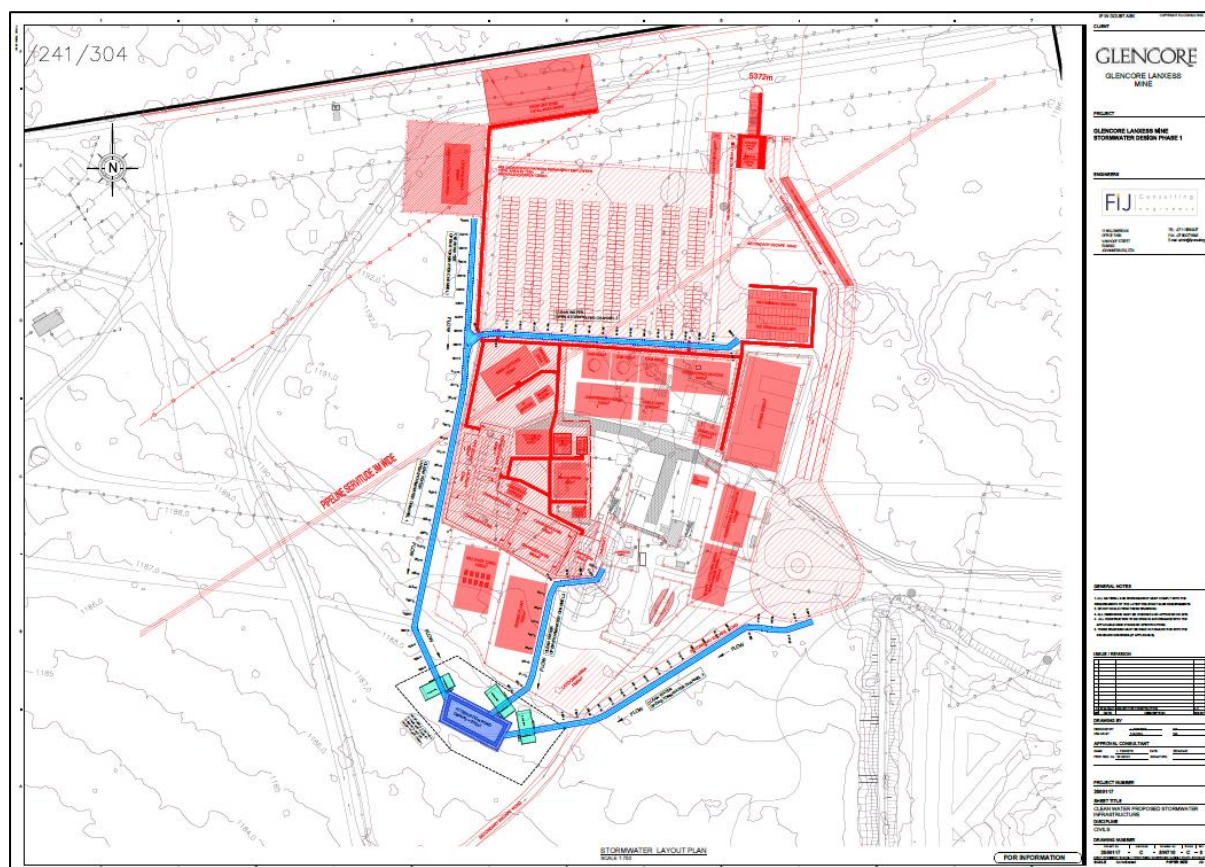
Detailed layout for the proposed project (EIMS BID, 2024)
